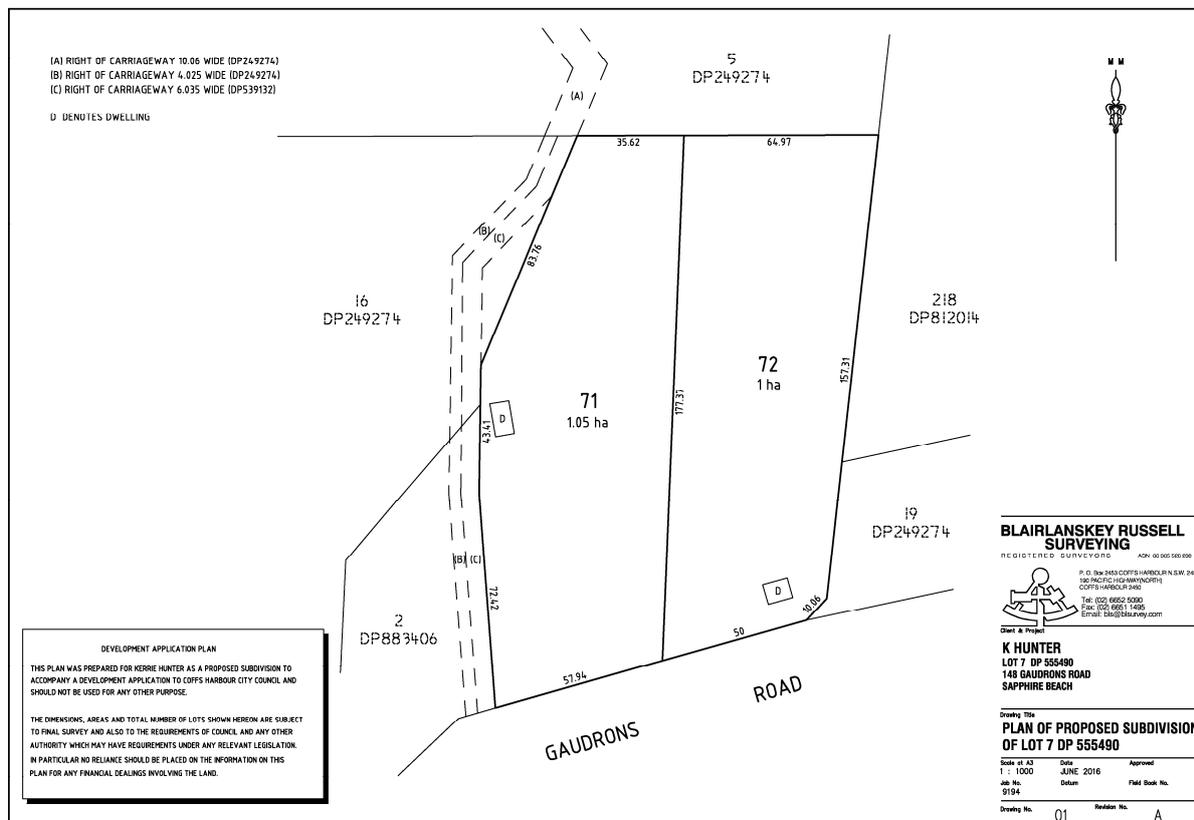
Proposed concept layout. Source: Earth Water Consulting (2020)
